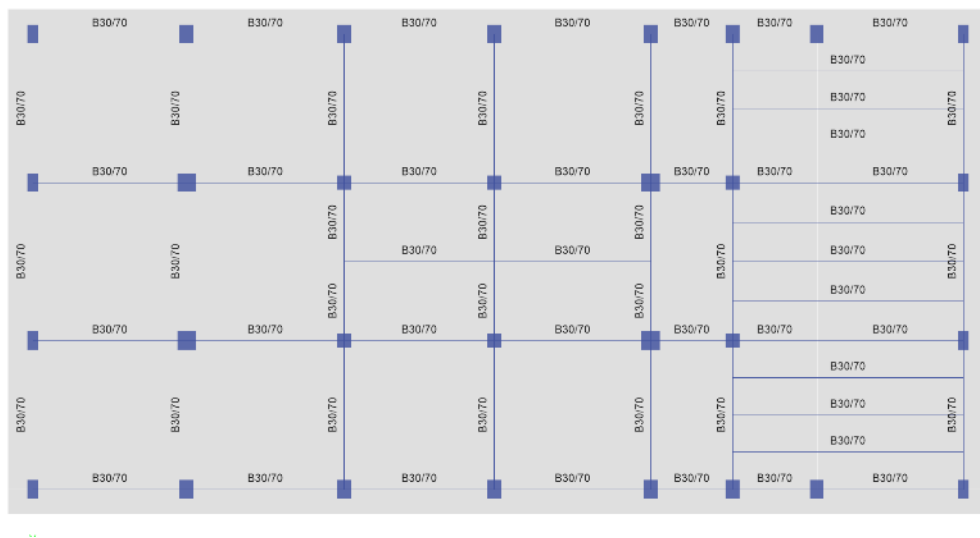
Formwork plan and element sections for the 2nd Floor.
